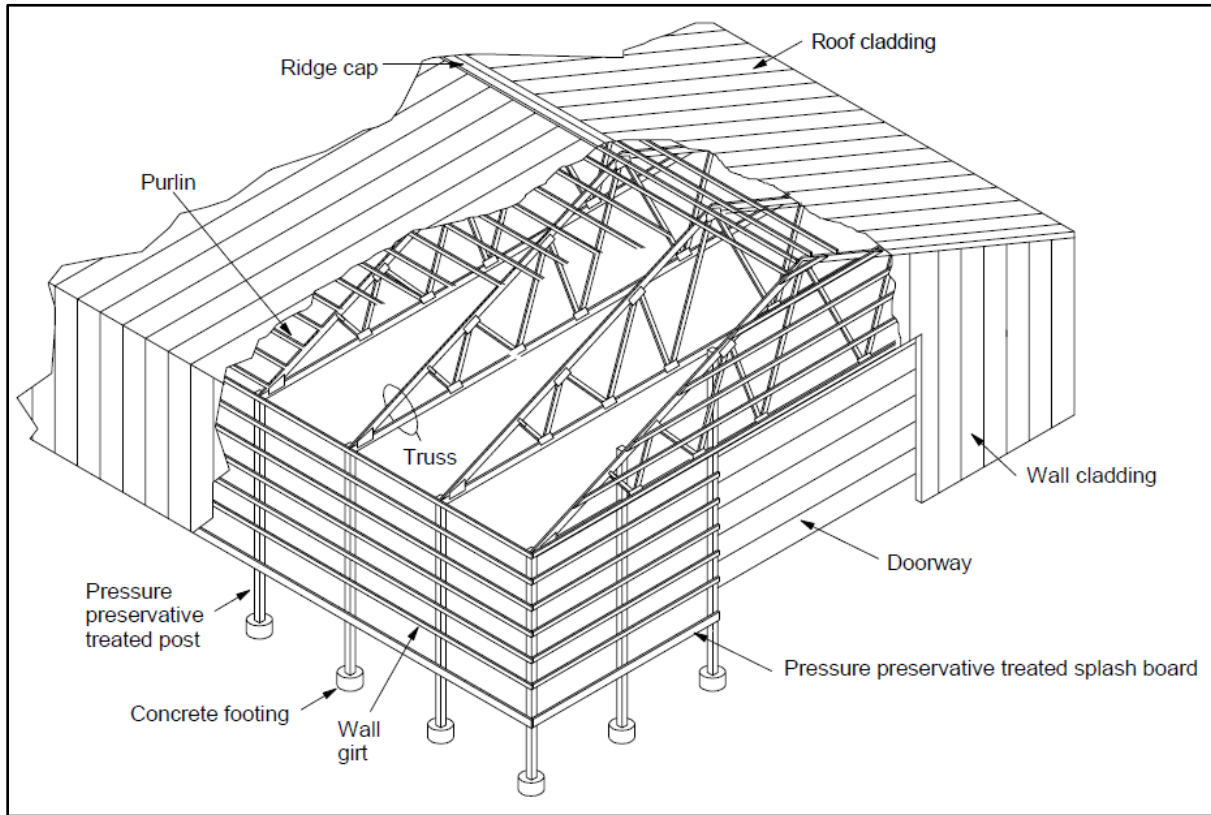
Components of a typical post-frame building (Post-Frame Building Design Manual, 1999)
